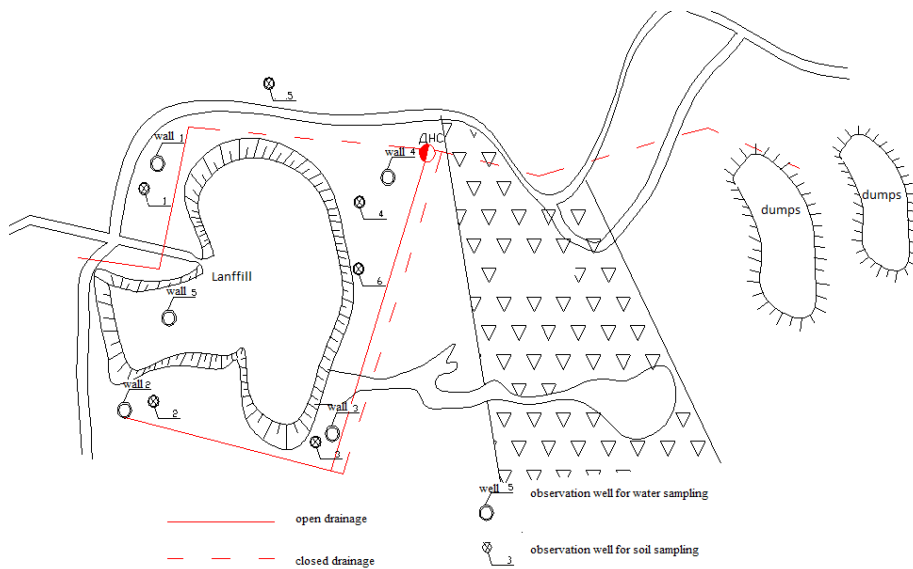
Layout of the landfill and collector-drainage system for drainage water drainage
